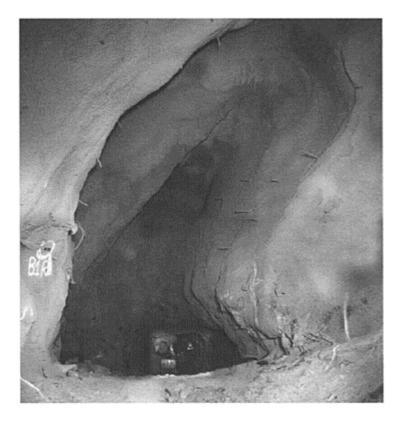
Looking back north along P3849 SEDR (20B) at the failure profile, dominated by the strike of the J46 fault (the photograph has been taken from the top of a 4 m high ramp used during the rehabilitation—notice the vent bag in the top left hand corner of the original drive profile).
